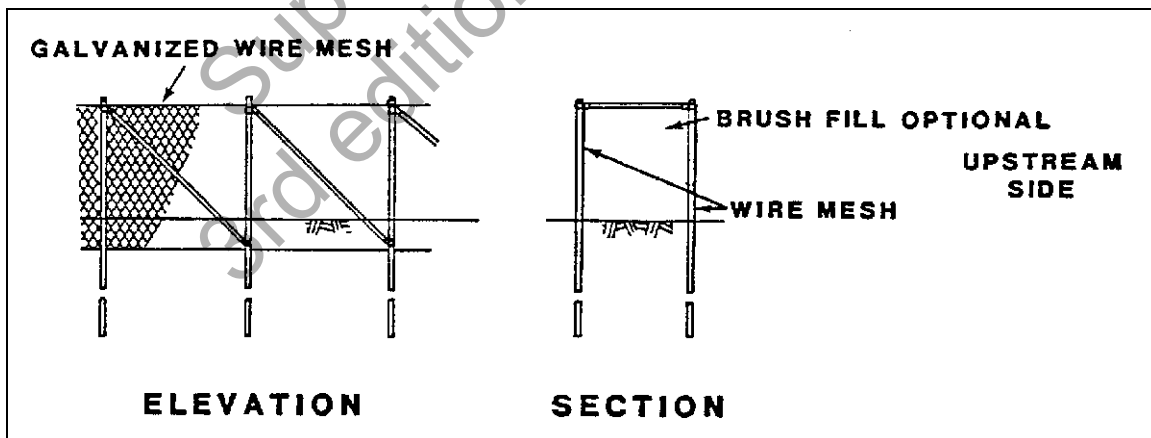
Light double row wire fence retarder structure (after Brown).⁽²⁾
